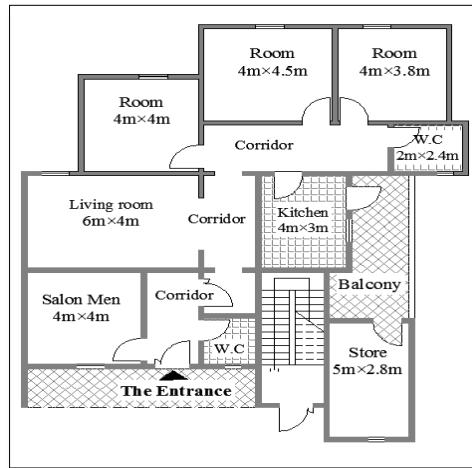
First floor plan of Hussein Mohamed house in Ghadames.
